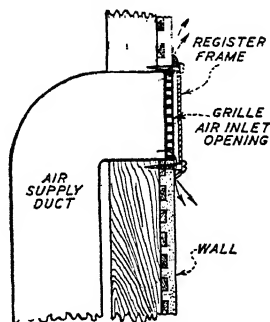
Grille Air Duct Openings Installed on Wall Surfaces or T boards
